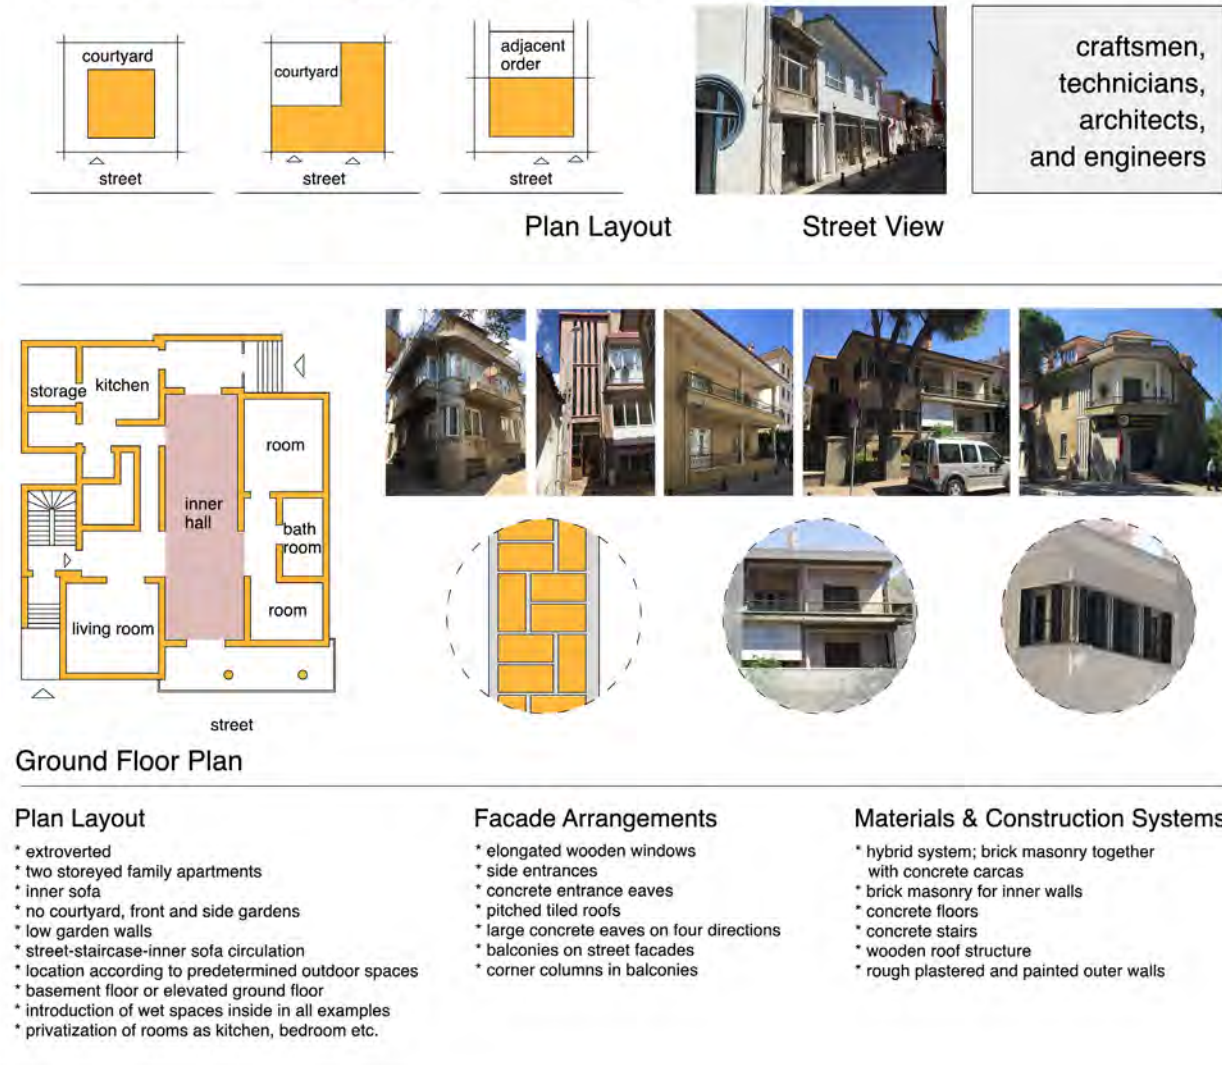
Distinctive features of the vernacular houses constructed between 1950s and 1970s: early concrete buildings.
